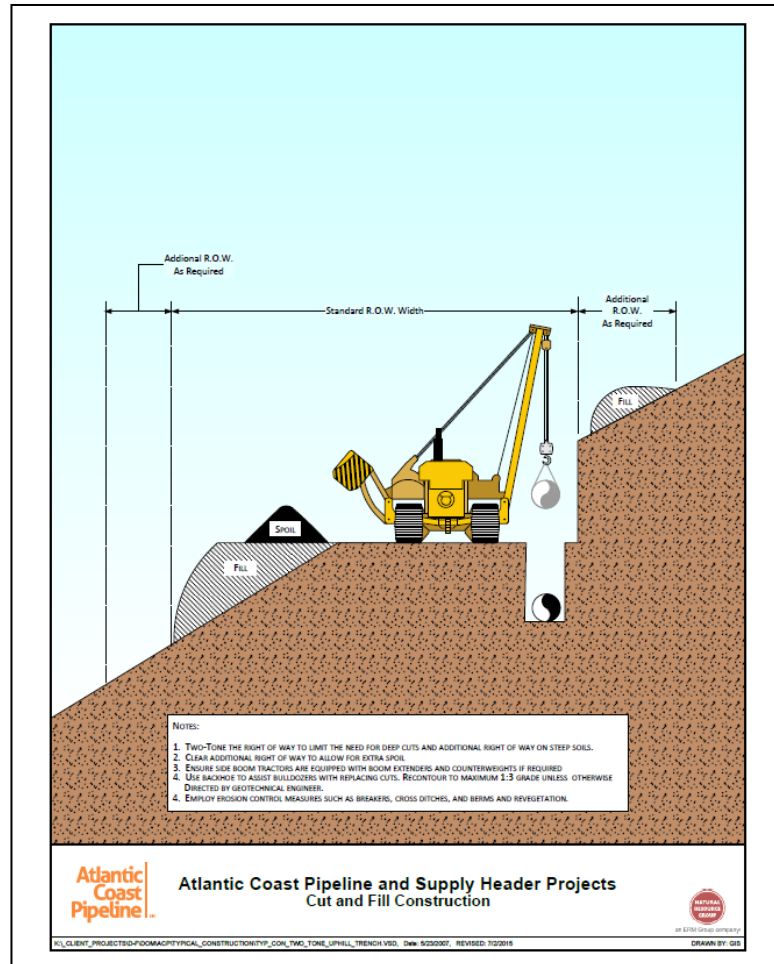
ACP typical section demonstrating removal of elevated side slope areas along the proposed ACP construction areas to create level work areas.
